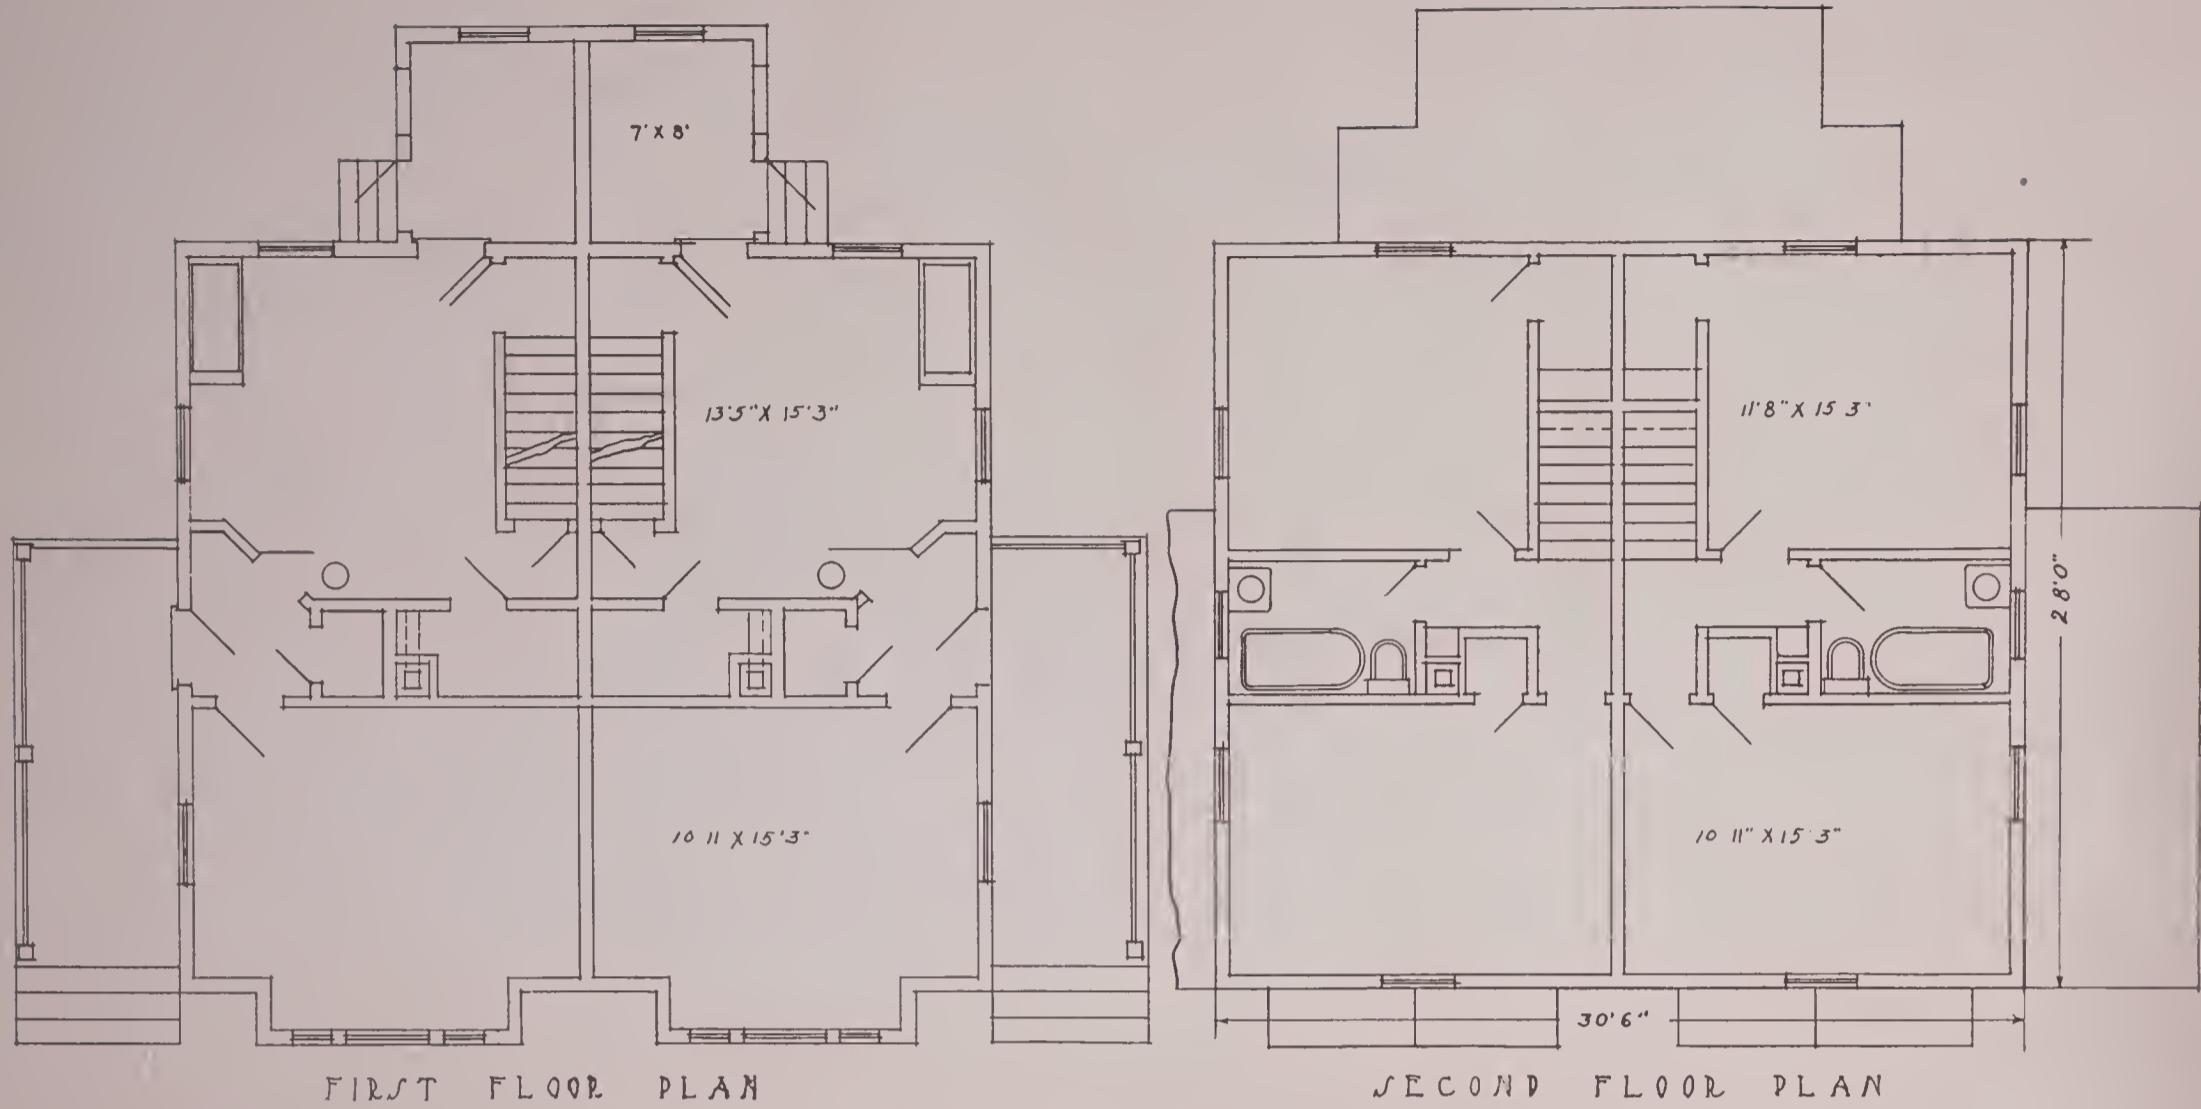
PLATE XIIa.—Floor plans of Plymouth Cottage. An eight room twin house erected by the Ludlow Manufacturing Associates at Ludlow, Mass. Cost, \$2,600.00.
